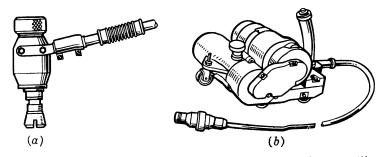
Air-operated bush hammer (a) and planetary electric mill (b)
